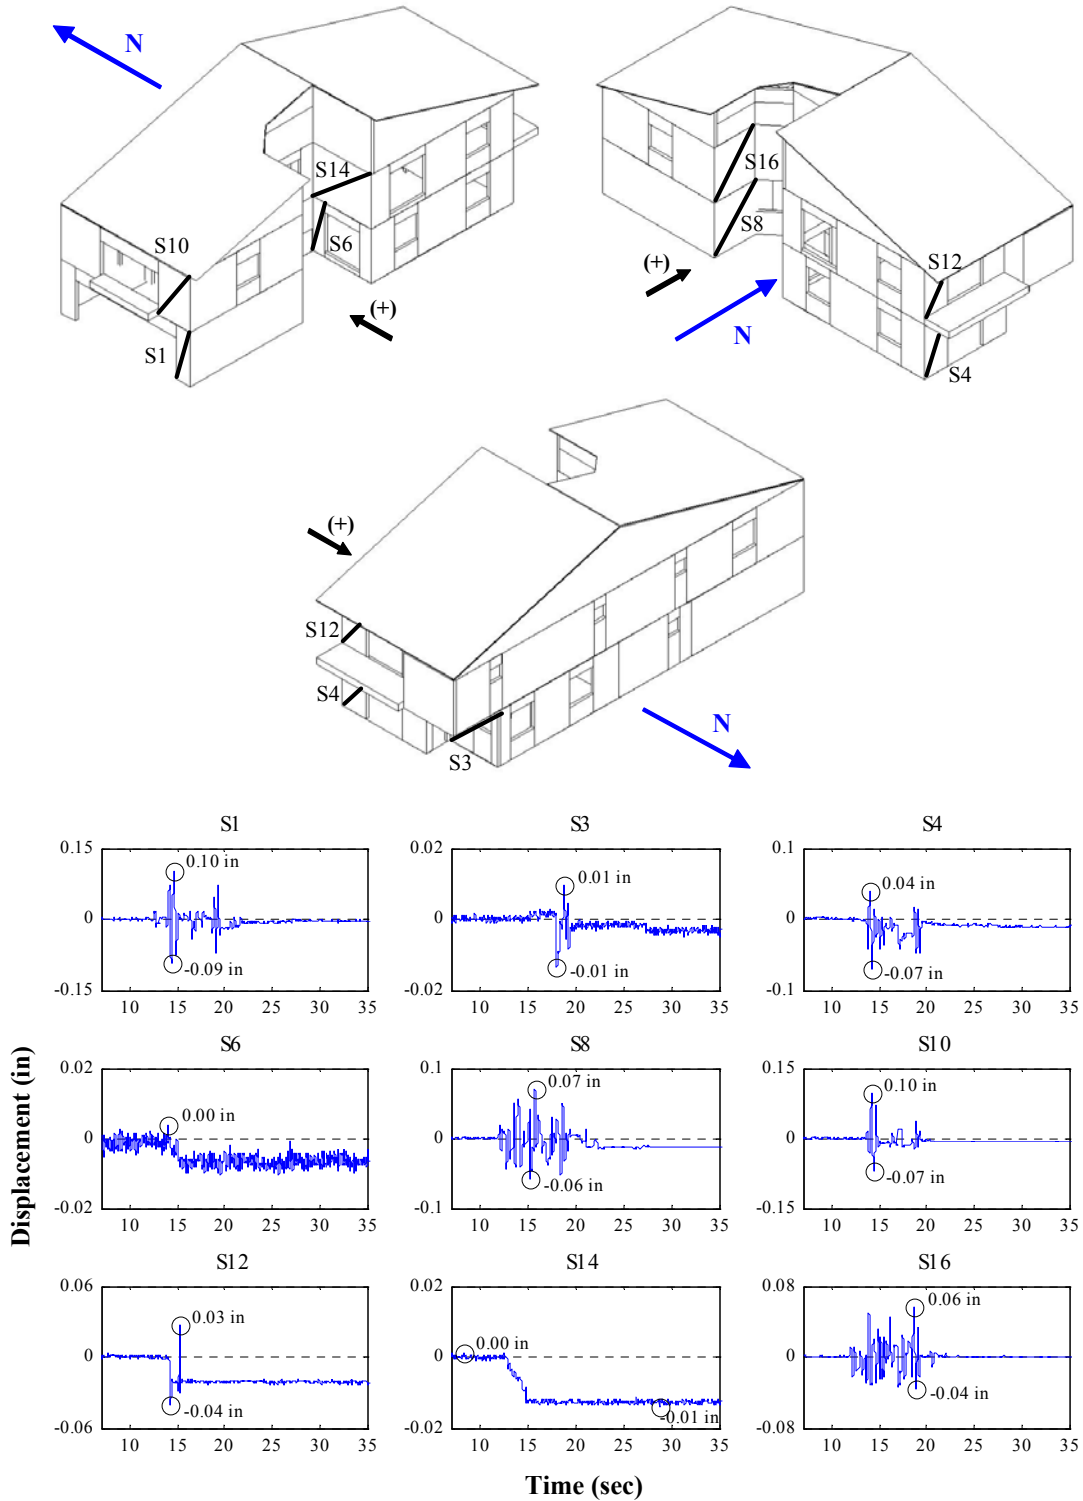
Wall deformations of north-south external walls for Test NWP2S11
